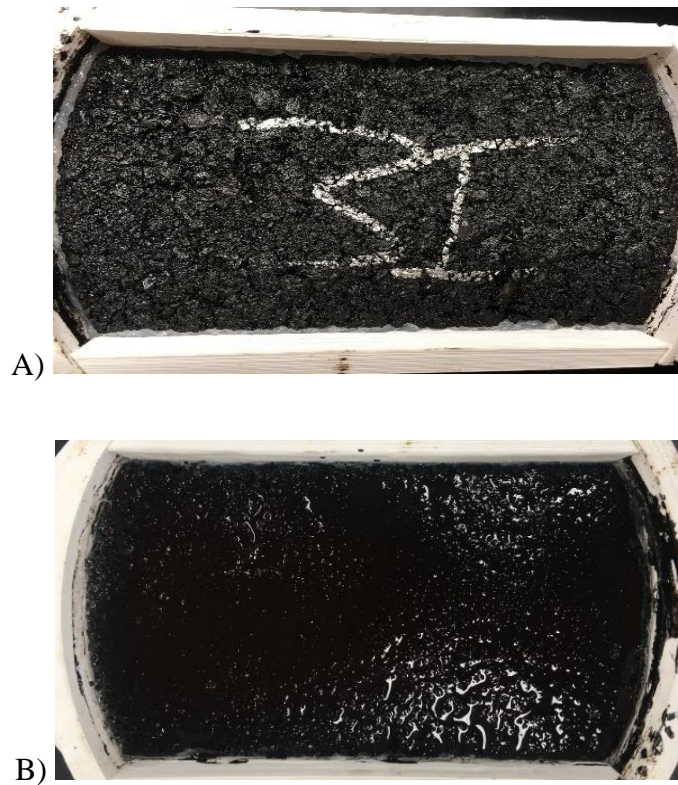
Texas Overlay Tester in 3D Printed Mold. A) 3D Mold Surrounding OT Sample B) Tack Coat Applied
